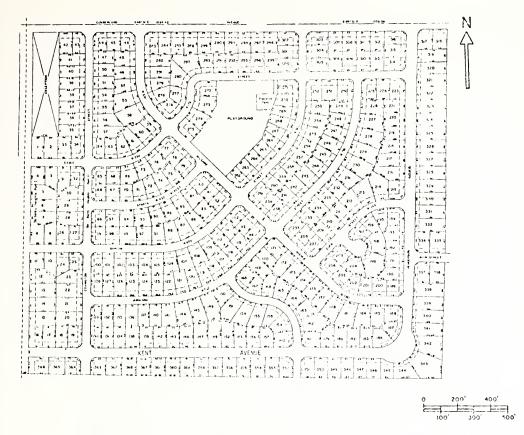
Plan Drawing of the Bar Barry Heights Subdivision.
